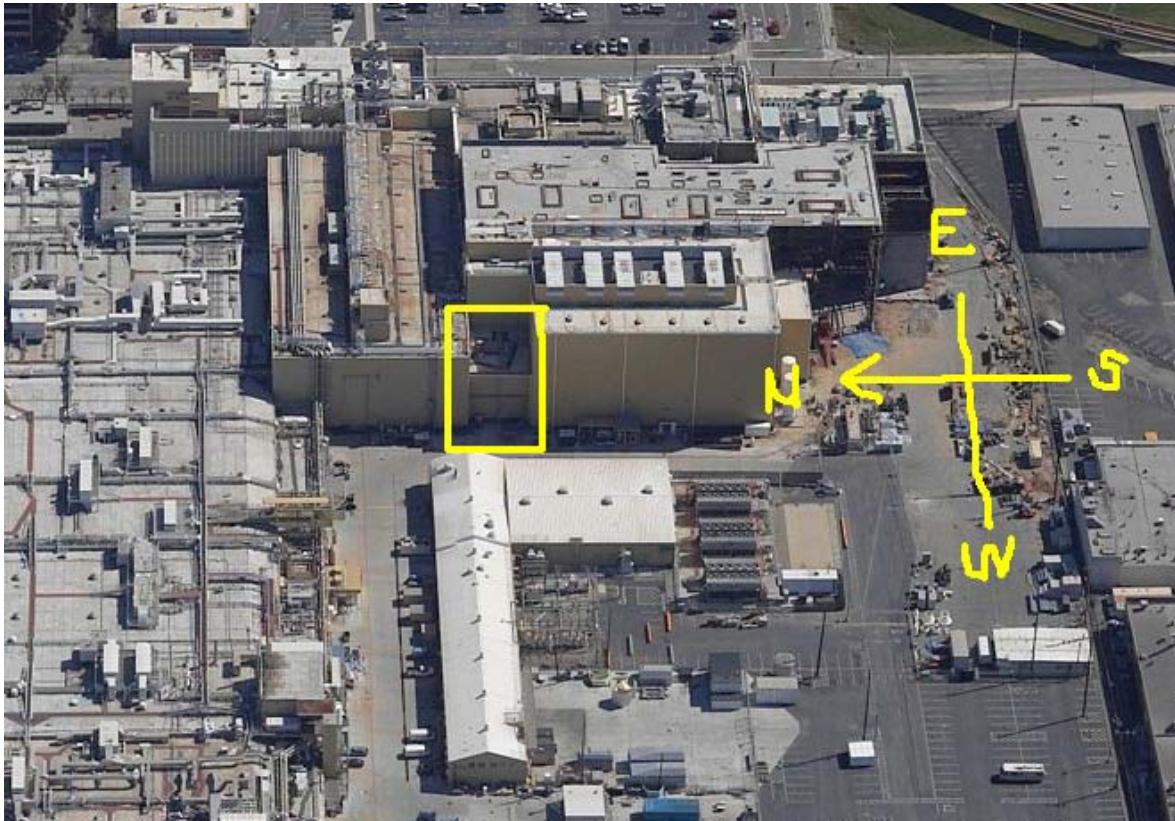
Aerial Photo, west facing exterior wall and roof of the A6 Chamber
